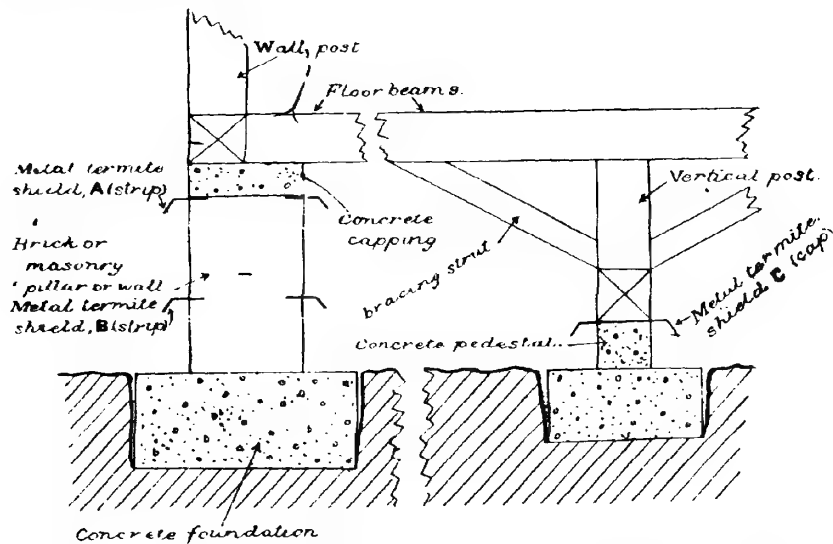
Foundation walls and pillars of a wooden frame-building showing the position of metal termite-shields. A, on a stone wall, B, alternative position on a brick wall or pillar, C, on a concrete pedestal.
